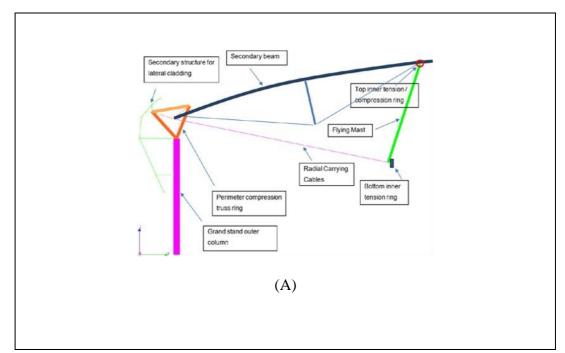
Typical Roof Structural Module: Schematic Description Source: (Upgrading the Spoke Wheel Stadium Roof Concept: Ingenta Connect, 2020).
